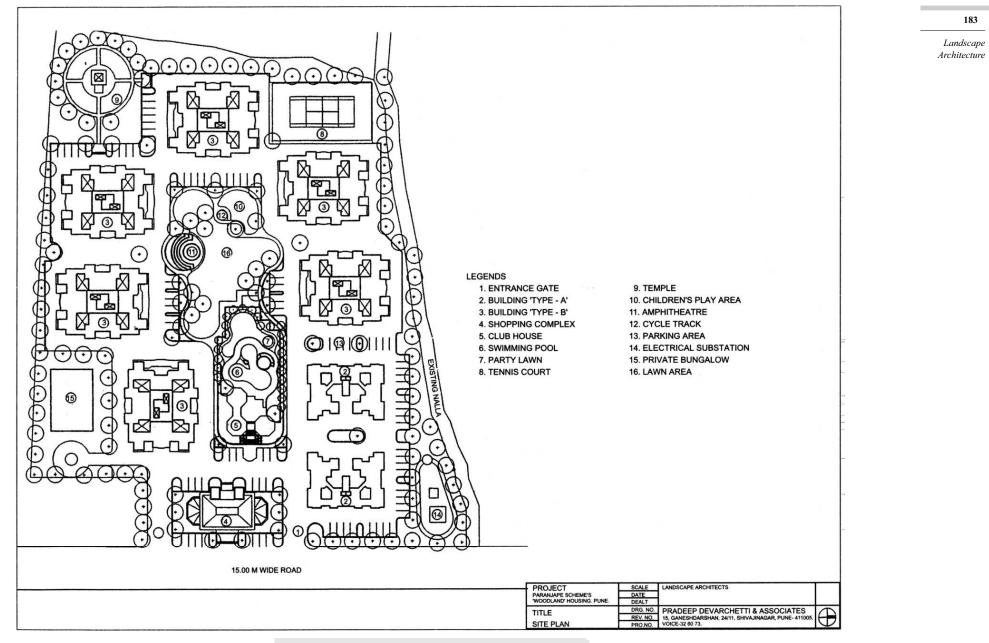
Site Plan after Landscape – Woodland Housing, Pune
